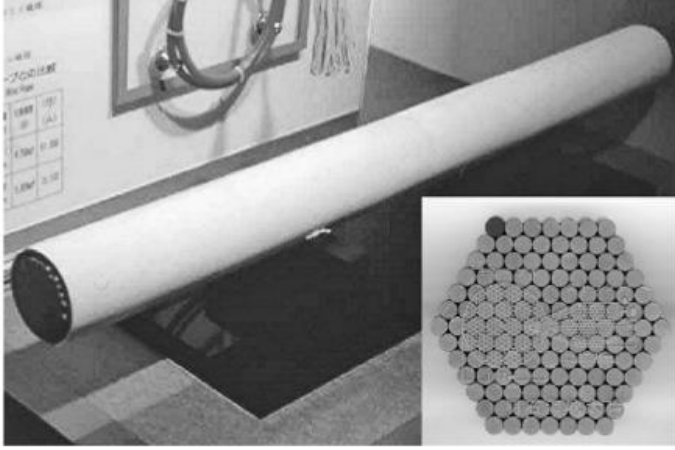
Prefabricated strand of 127 parallel wires, used in the Akashi Kaikyo cables and suspenders, and in the stays of Tatara Bridge.
